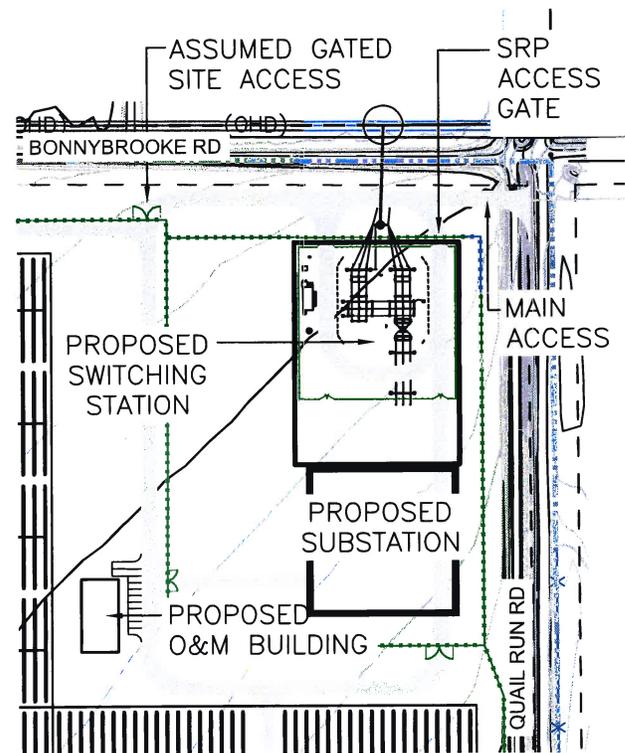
Bonnybrooke Solar Project Conceptual Layout Detail. This figures shows the access driveway and proposed switching station, substation, and operations and maintenance building.
